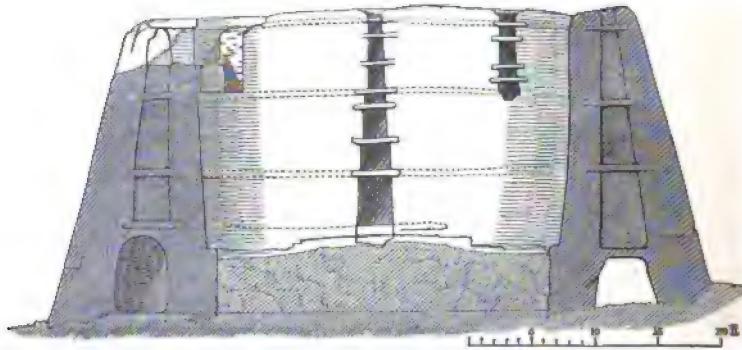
Sectional Elevation of the Broch of Dun Troddan, Glenelg.
